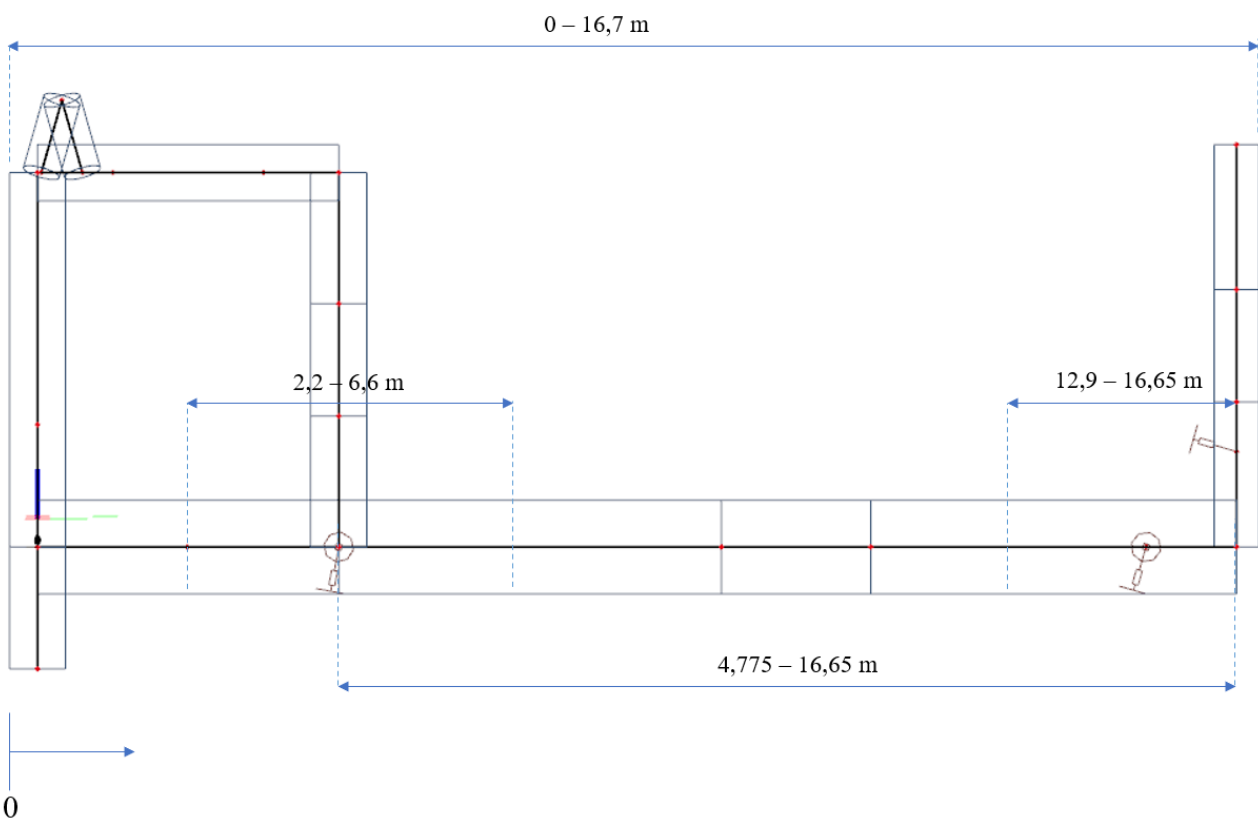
Reinforcement relief floor spreading distance of the additional reinforcement
